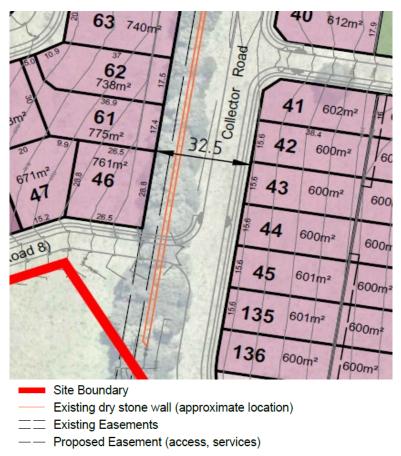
Plan Showing Location of Heritage Wall A within Proposed Road Reserve
